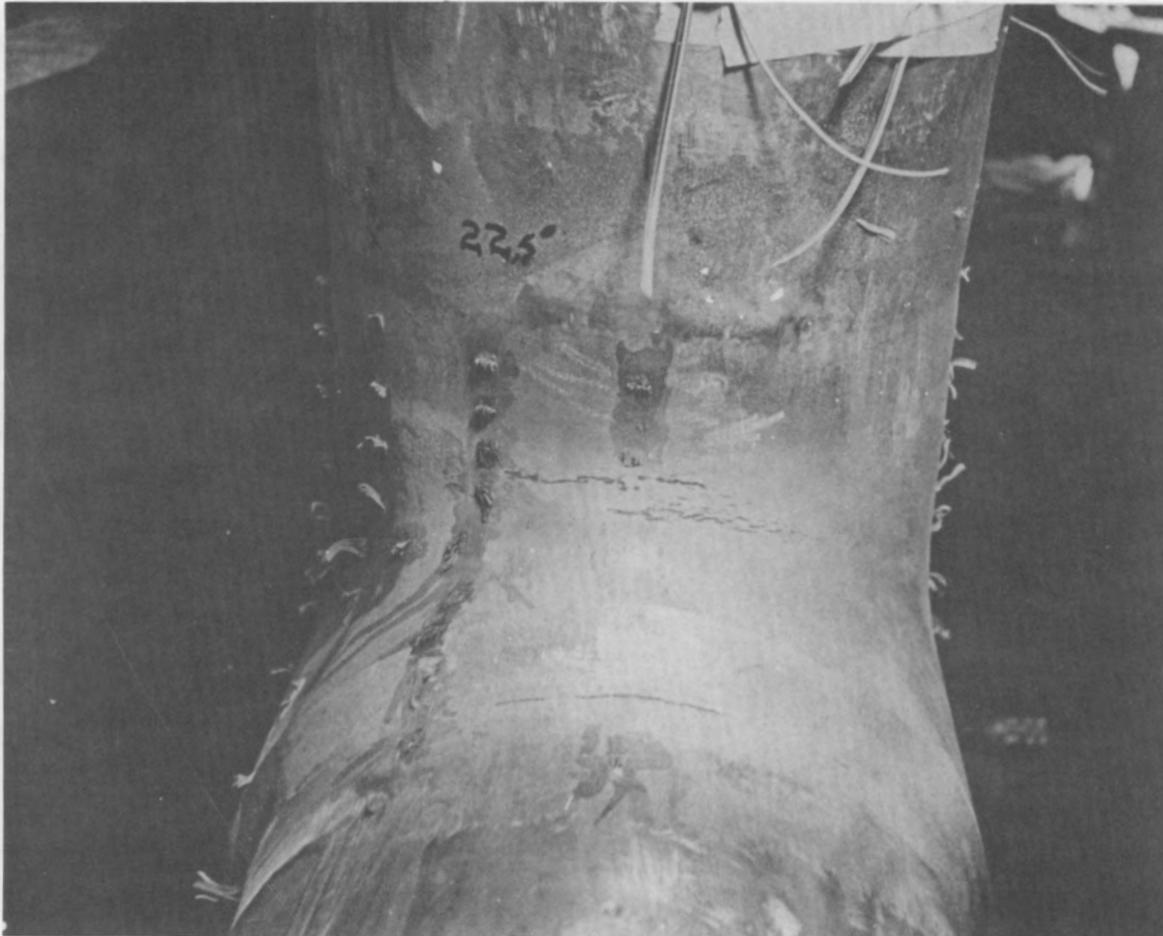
Fatigue cracks in T-7 after 6372 cycles.
